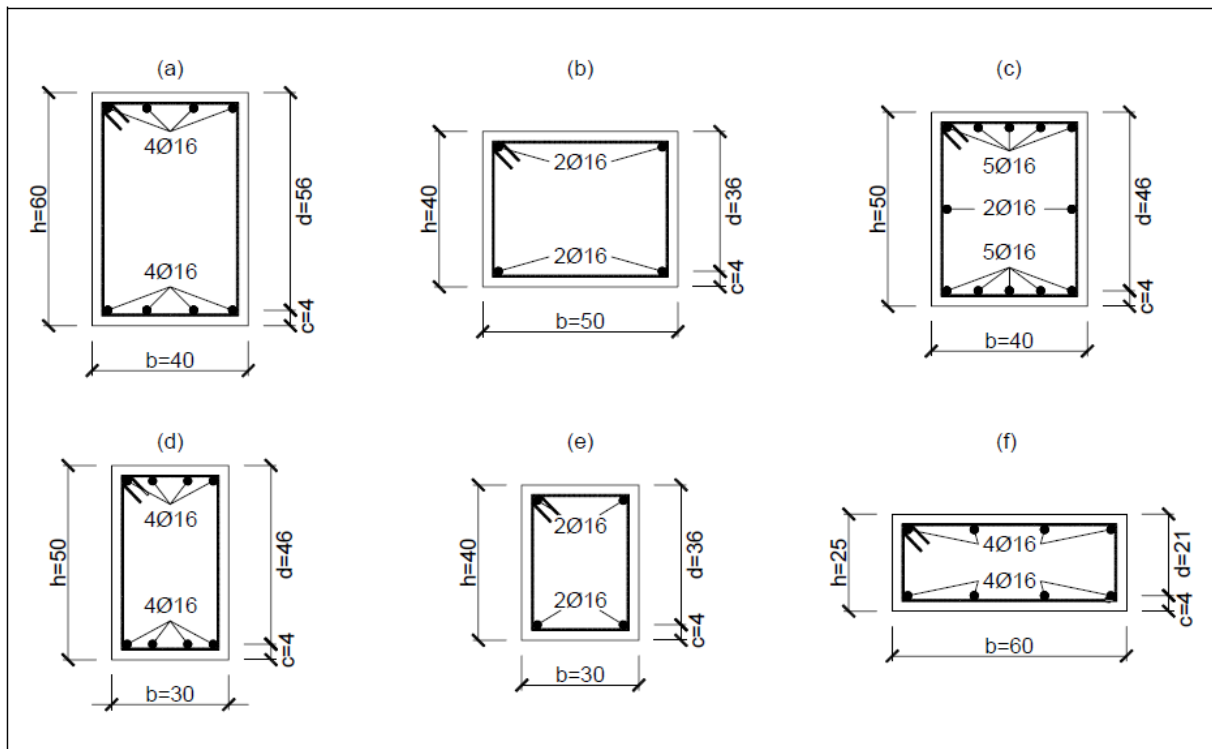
sections of RC elements: (a) Main beams, (b) Secondary beams, (c) Columns, (d) Beams of intermediate landings of the stairwell, (e) Side beams of the stairwell on the second and third levels, (f) One of the side beams of the stairwell on the first level.
